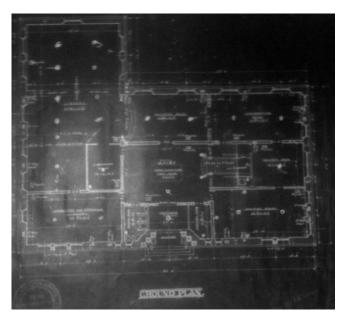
Potter's drawing of the first floor. He placed the books in the far left-hand rear of the building, broken up by smaller reading and reference rooms around the central core. Photo, the author.
